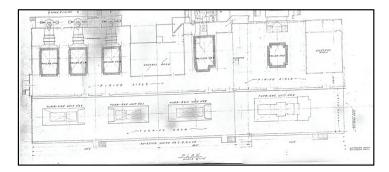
Architectural Floor Plan at the time of Unit 4 construction. Glendale's Steam Power Plant Drawn by Daniel Elliott (Collection of City of Glendale Water & Power)
